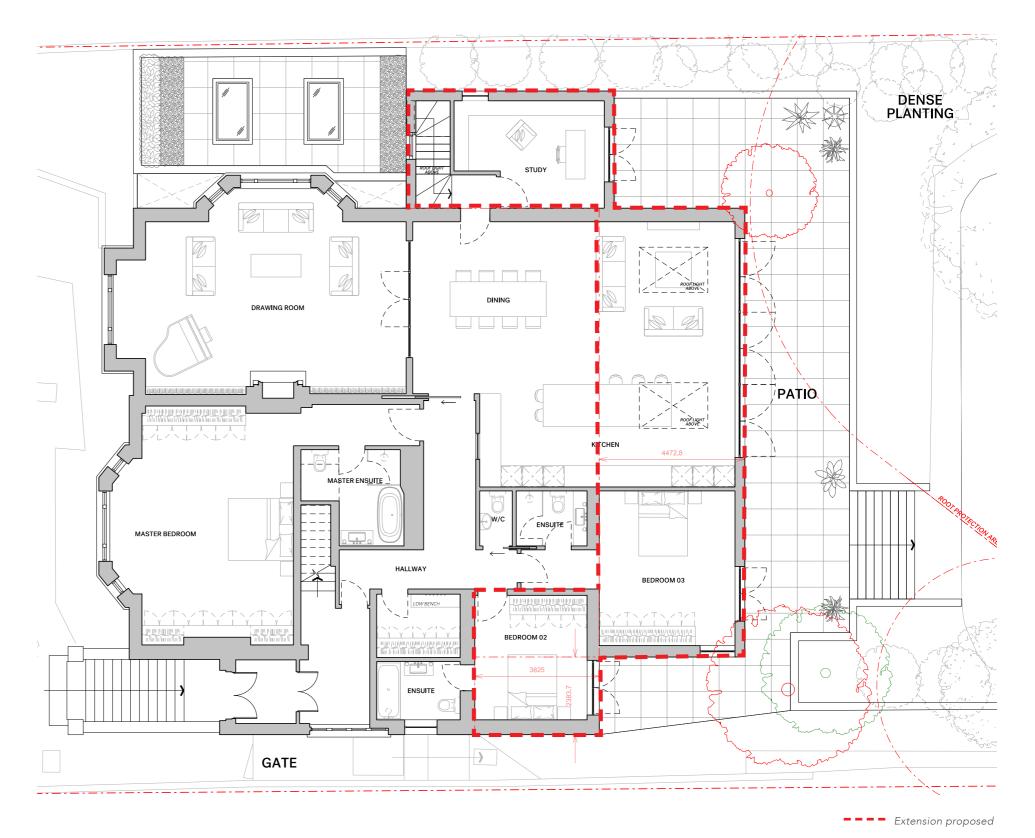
Diagram Fig. 5.3 Upper Ground Floor
